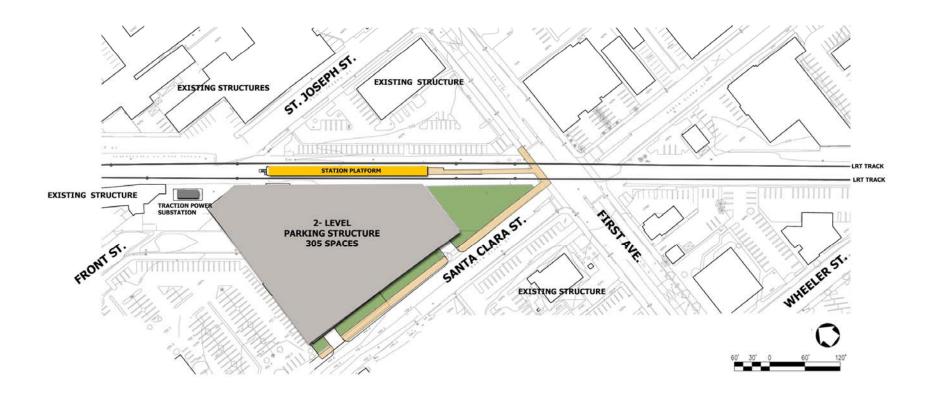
Site Plan: City of Arcadia Station, Option B
